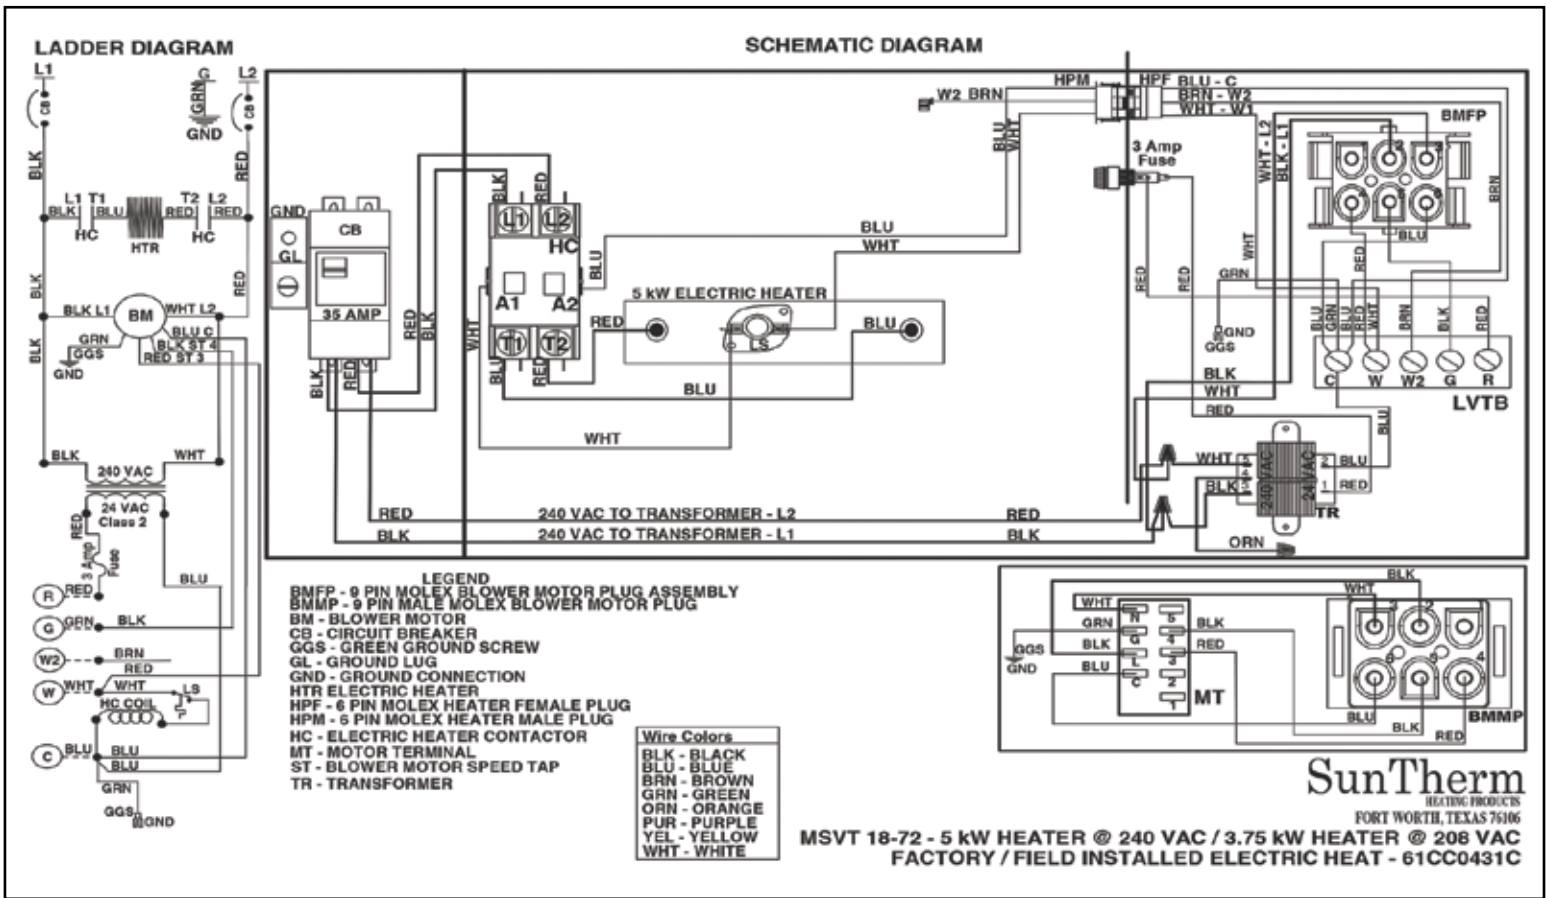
MSVT 18-72 – Constant Torque Motor – 5kW Electric Heater
